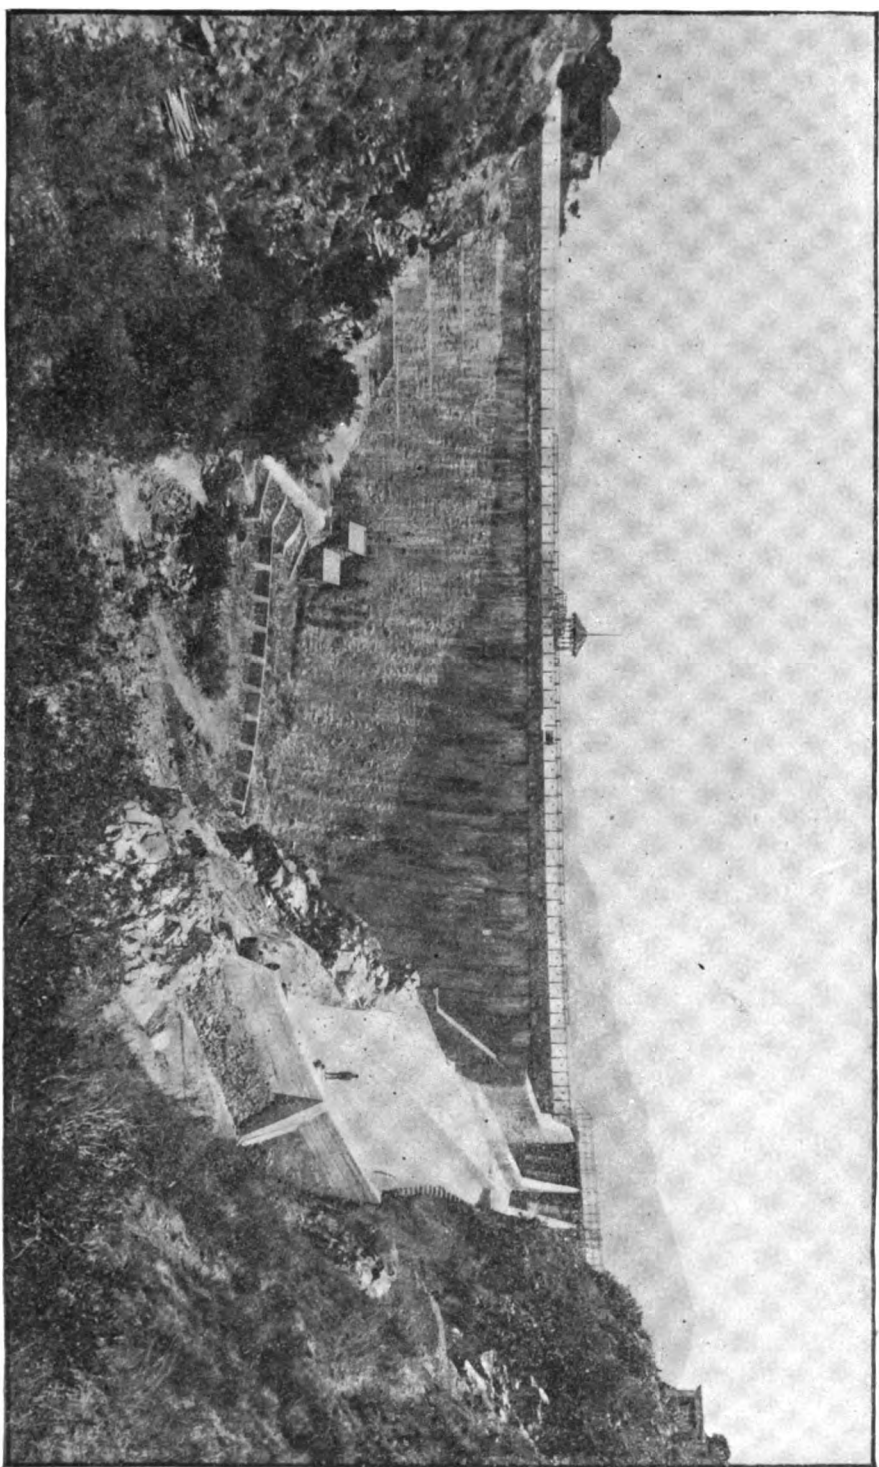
SWEETWATER DAM, SHOWING NEW APRON OF SPILLWAY AND PROTECTING SPUR-WALLS ON PIPE-LINE.
